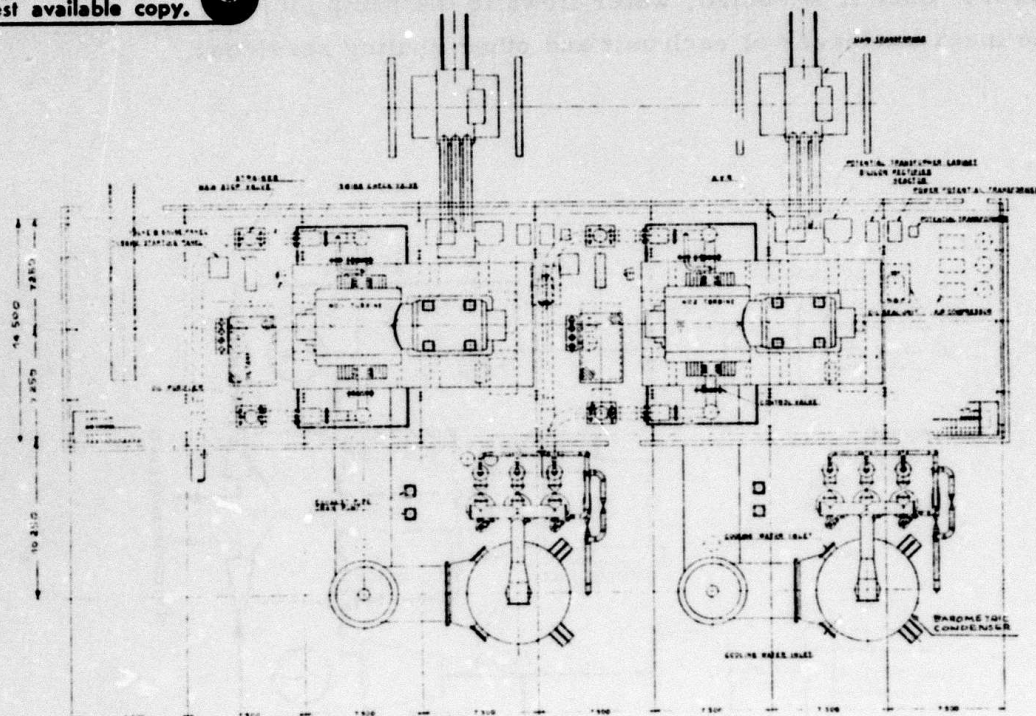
General plan of Cerro Prieto geothermal power plant (dimensions in m)[122] .
